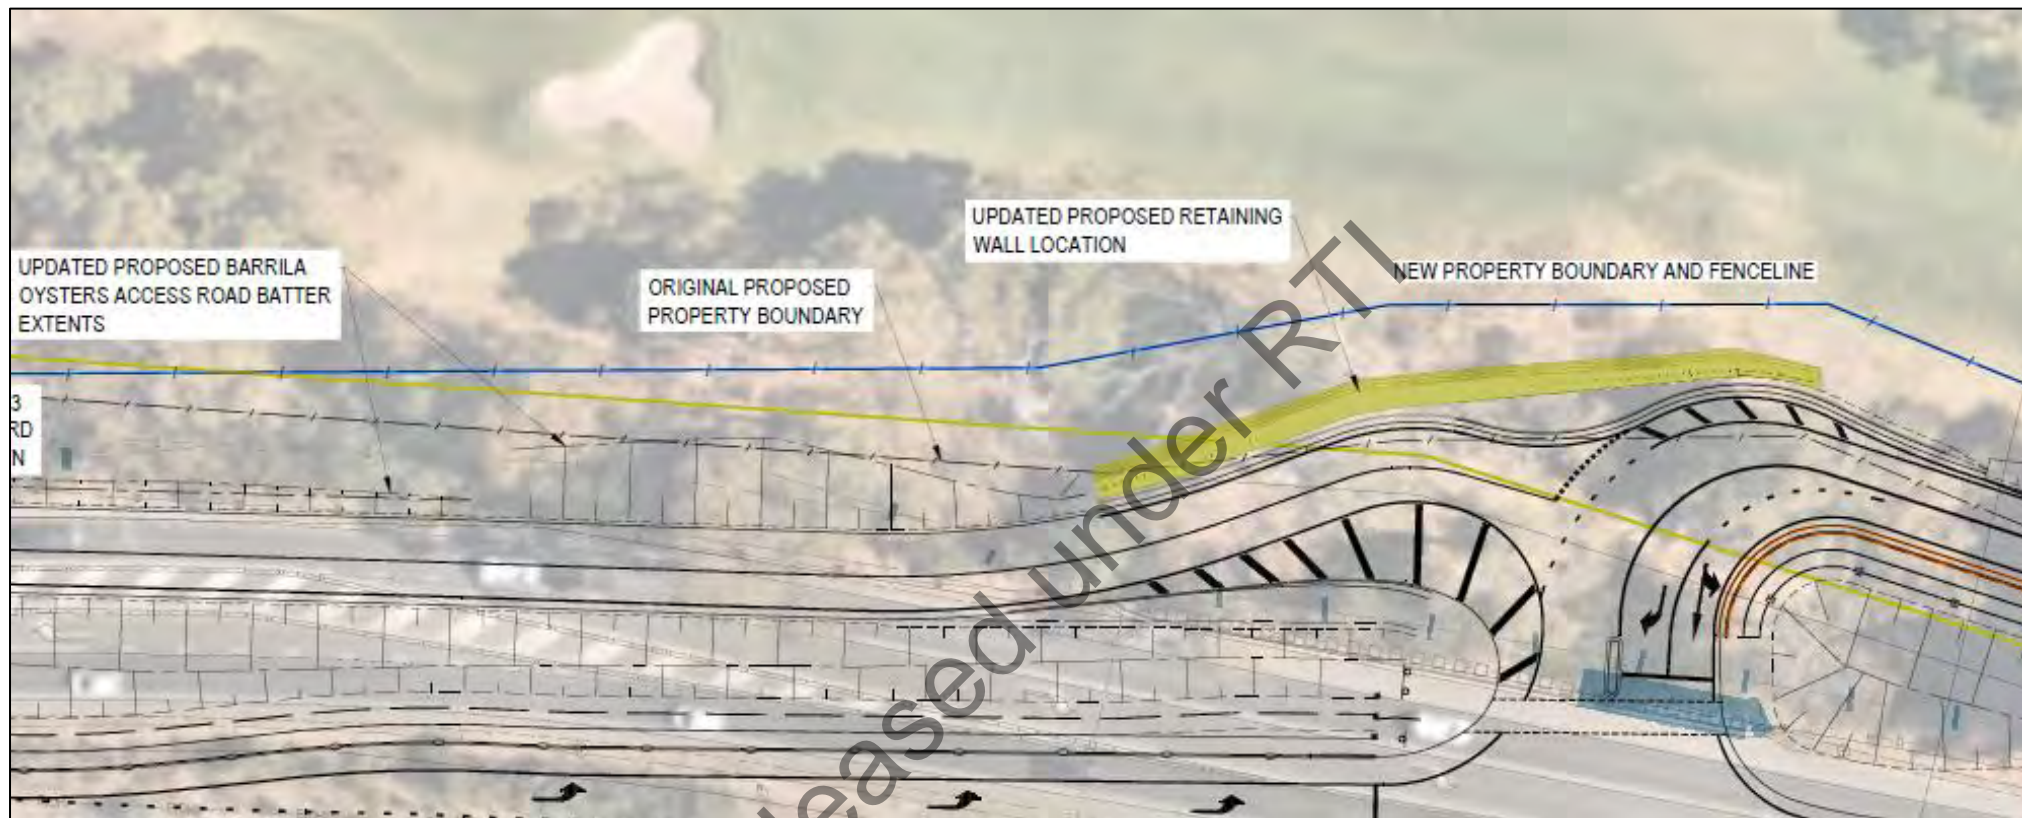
Detail of road design plans showing gap between edge of earthworks and new property boundary fence
